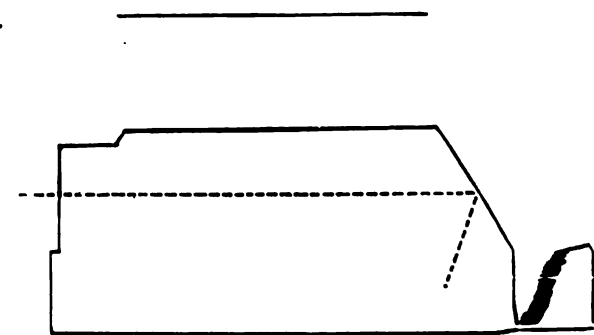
Cross section of room with sloped inner wall, with a ray of light reflected from wall.
